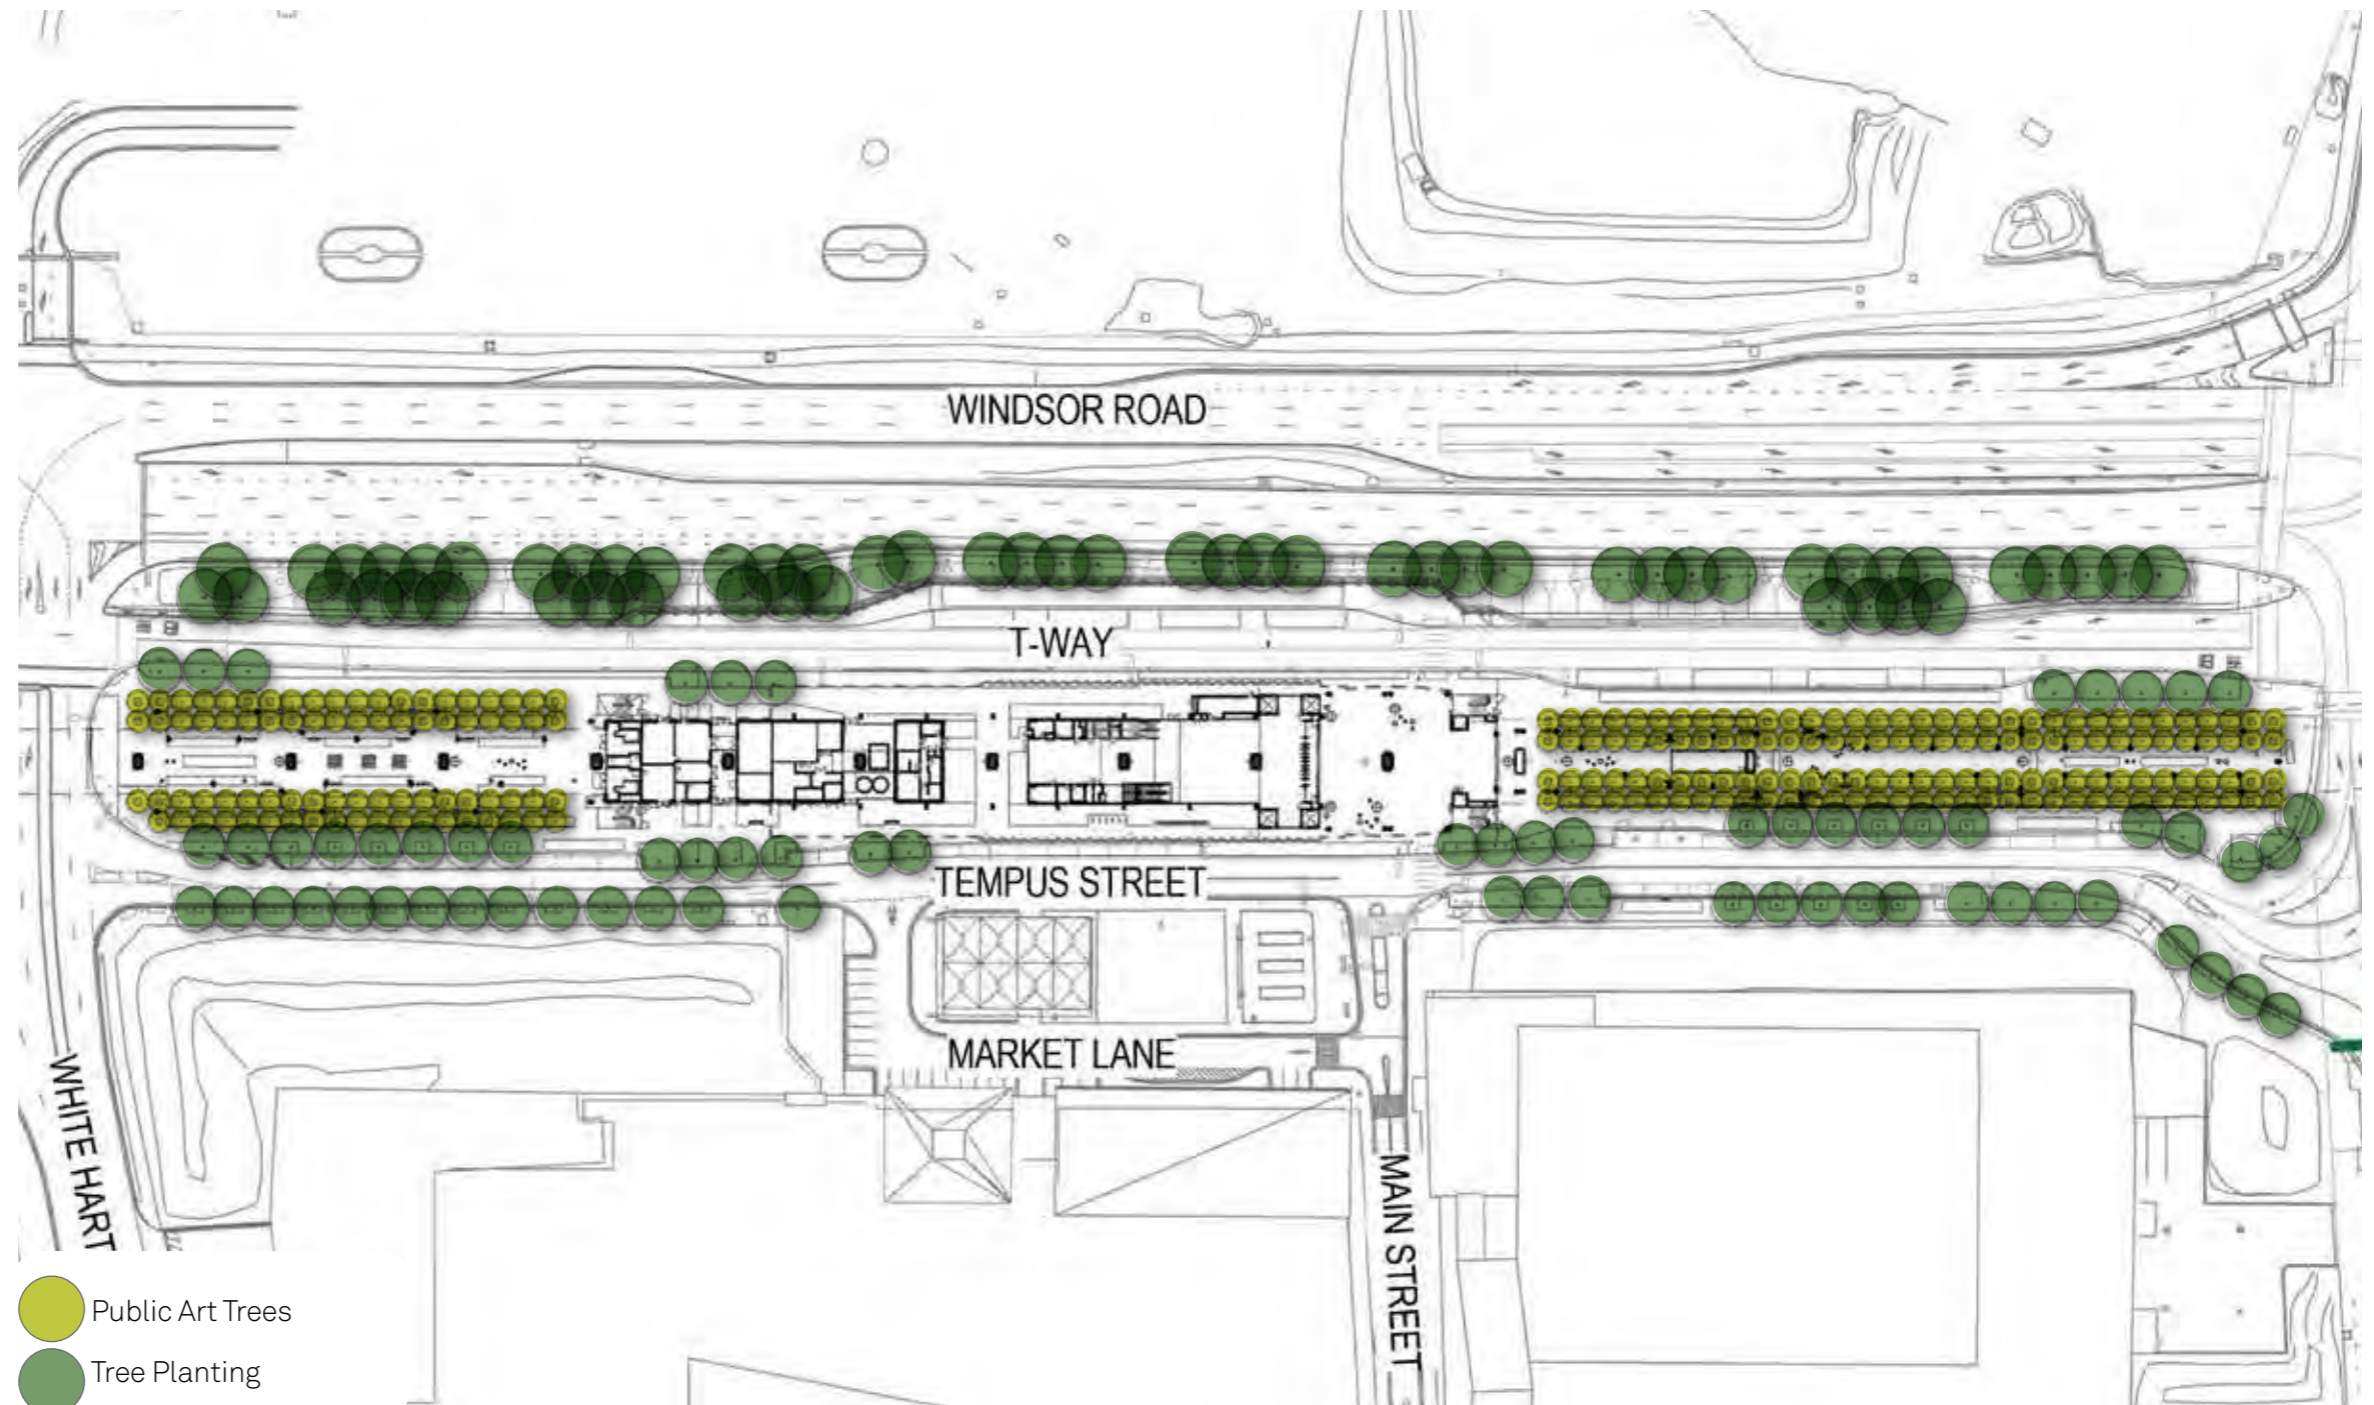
RSH\_Rouse Hill Station Plan showing Tree Planting across the Precinct. Source: HASSELL.
